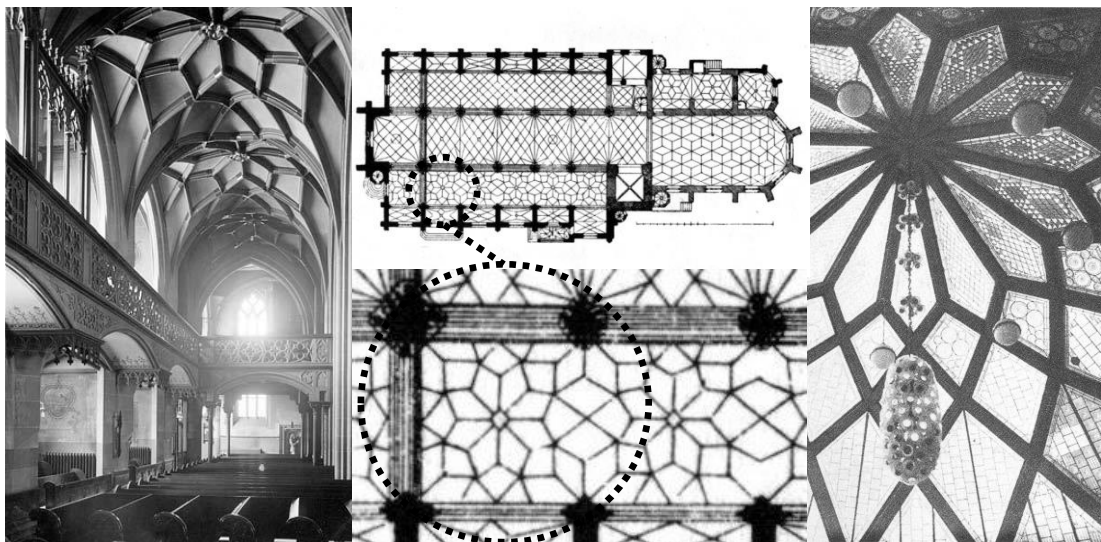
Left – Interior of Stuttgart’s *Stiftskirche* showing the south aisle with its original vaulting. Centre – Plan of Stuttgart’s *Stiftskirche* with an enlarged portion showing the layout of the rib vaulting above the south aisle (Image: www.commonswiki.org).
